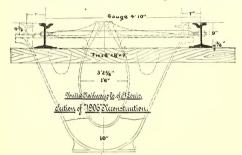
SECTION OF 1906 CONSTRUCTION, SHOWING OLD CABLE YOKES NOW REMOVED
